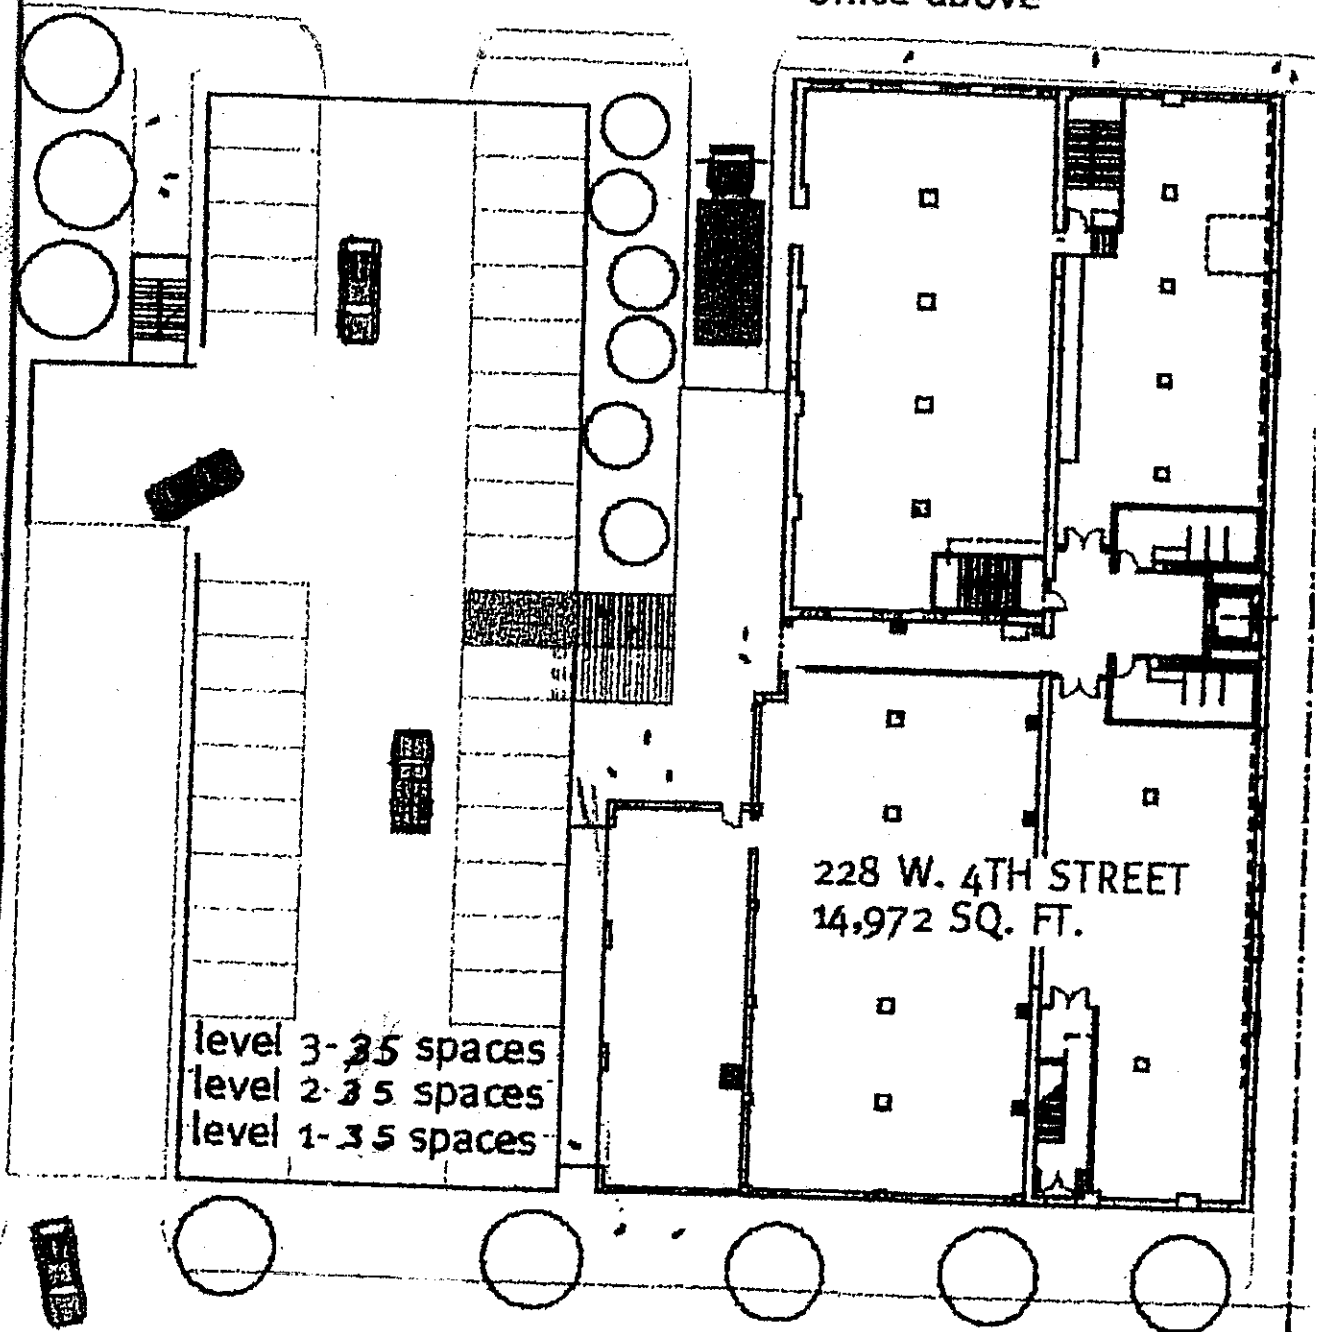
Site Plan with Projects - River Market TIF Plan
